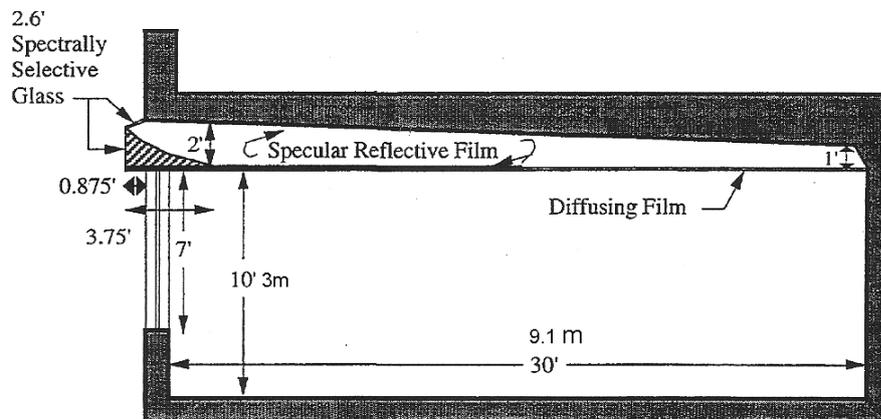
Section of the horizontal light pipe design (Beltran et al, 1996)
